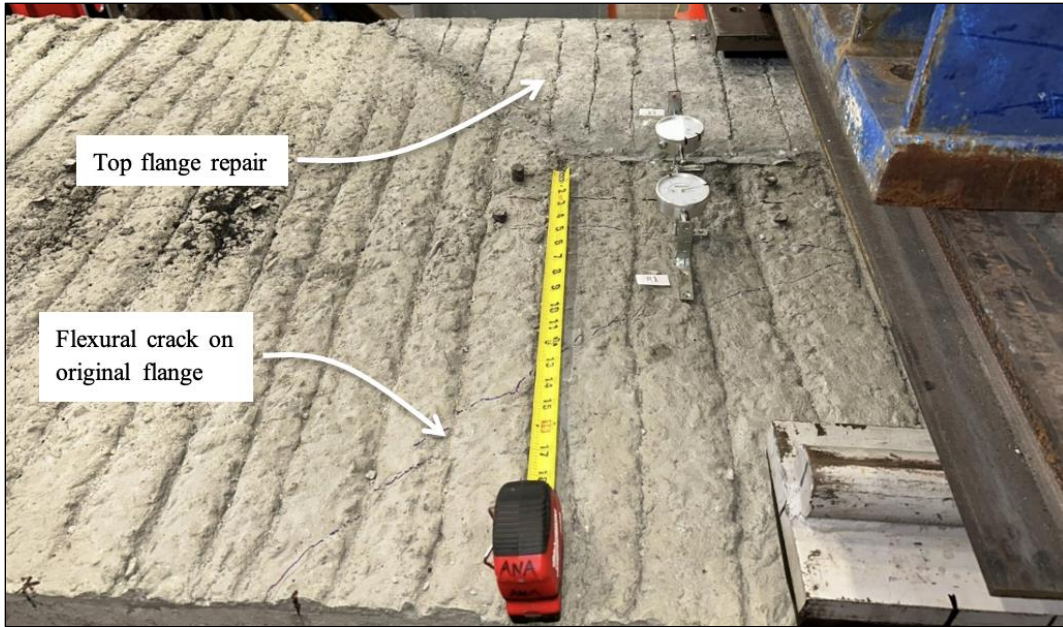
Photo. Test 1.2.F (repair 1.2LTF) top flange flexural cracks on original, nonrepaired flange at 30 kip (from top side).
